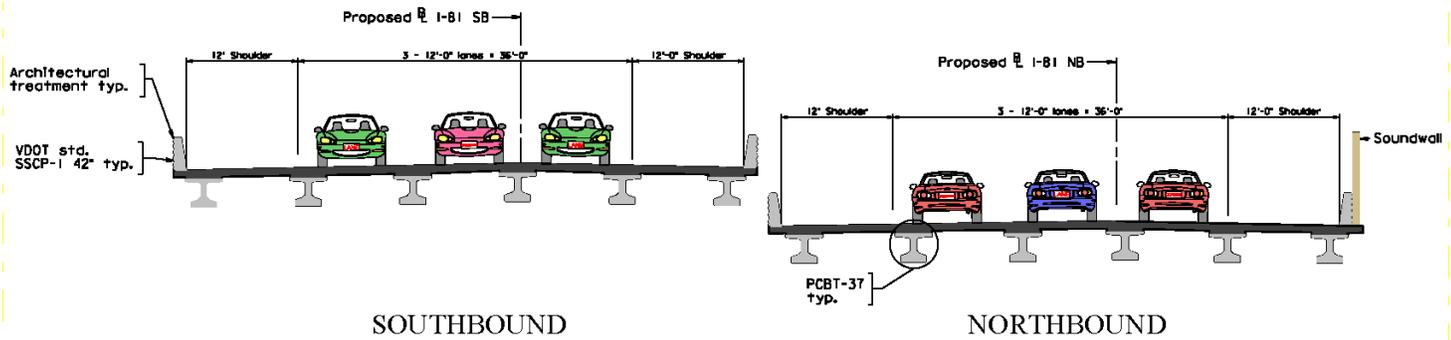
Transverse Section - I-81 Over Route 619 (Wildwood Road)
